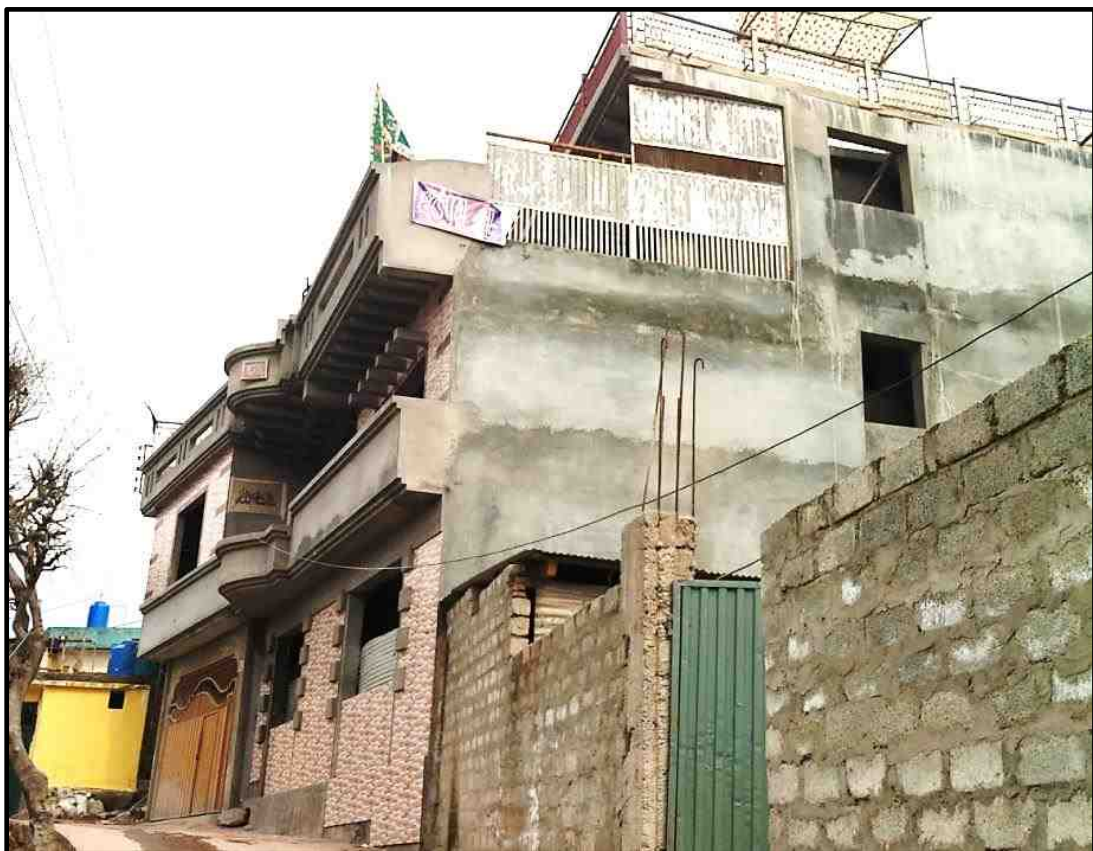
A three storey heavy pukka house in Red Zone, where only a lightweight single storey structure should have been constructed. (Source: Author (fieldwork))
